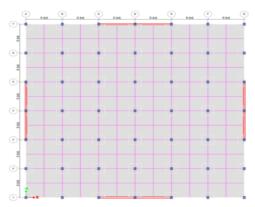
Flat slab with shear wall having (G+8) story building (Plan View)
